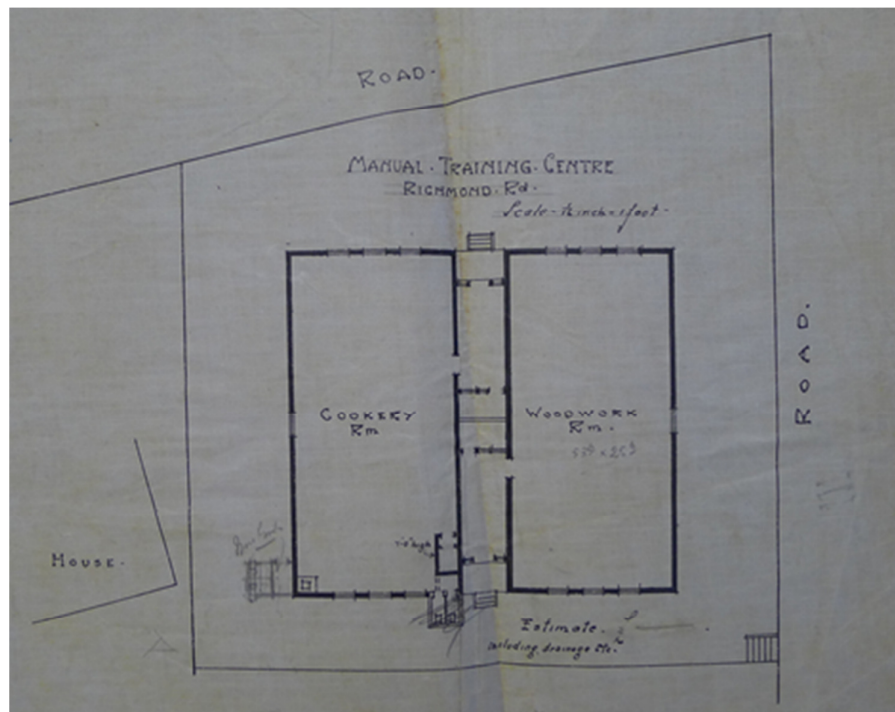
Floor plan Richmond Road Manual Training School (Archives NZ; undated)
